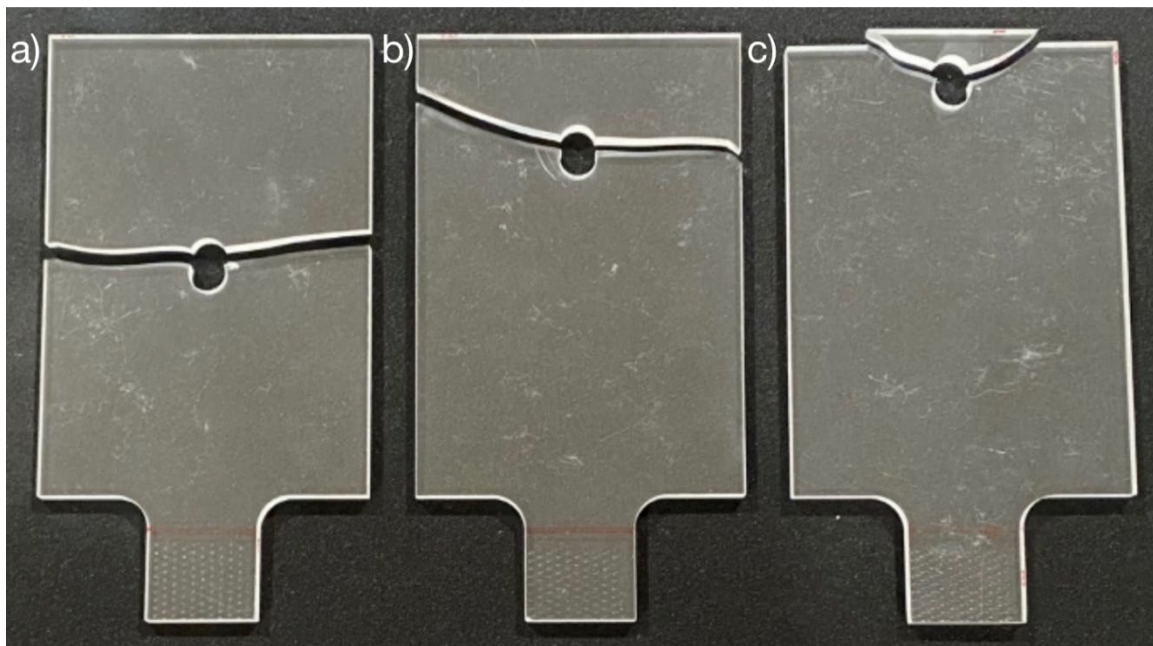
Specimen fracture with 8 mm bolt: a) P4, b) P5, and c) P6
